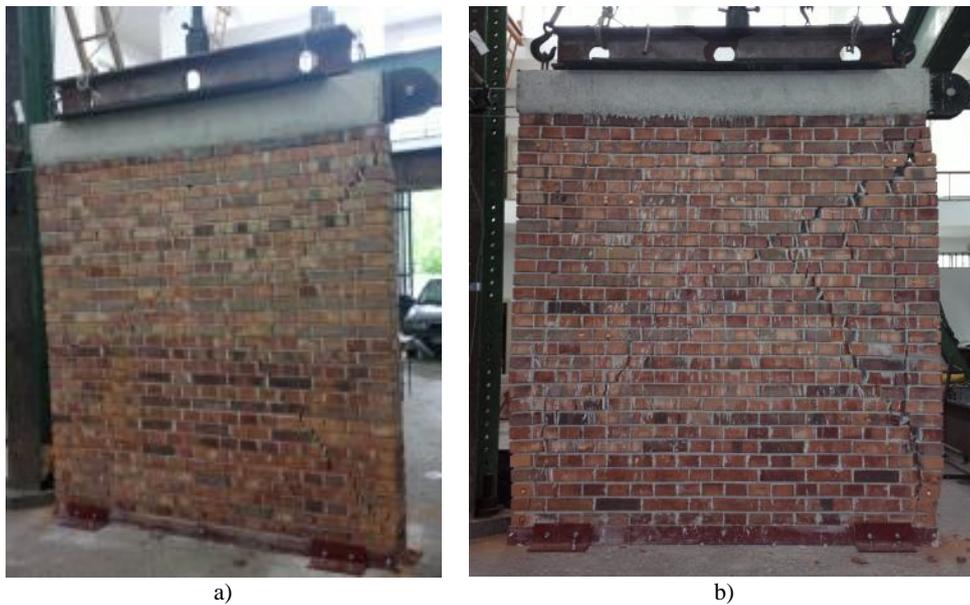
Diagonal failure pattern of the tested walls: a) W1, b) W2
